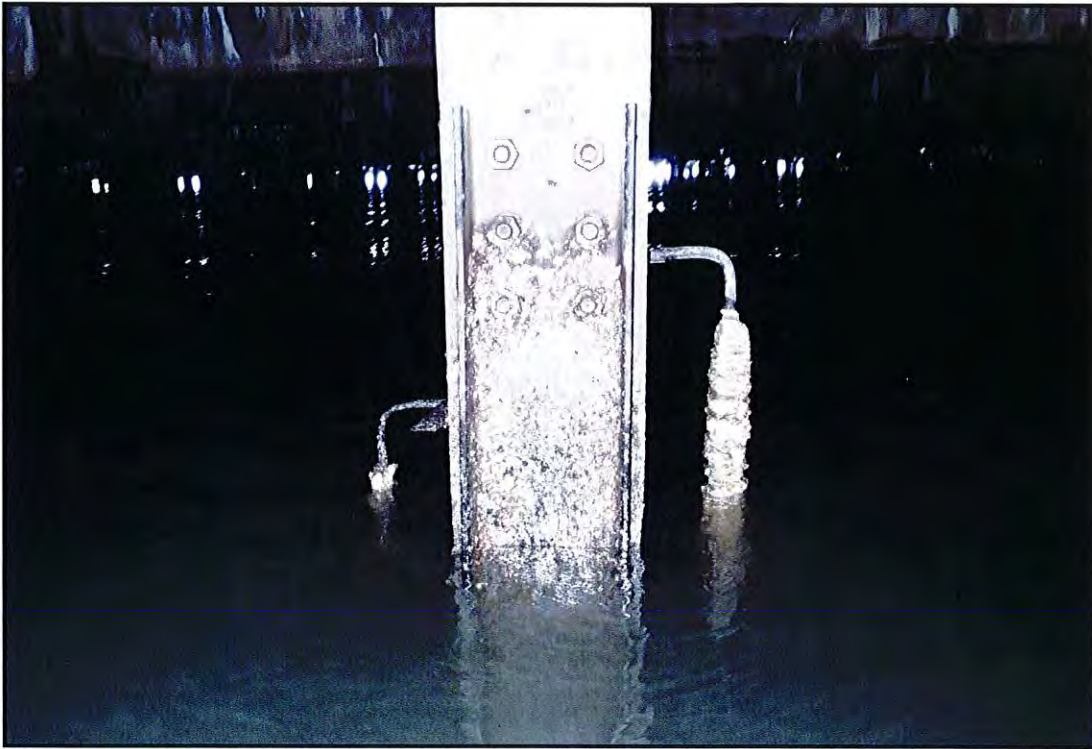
Typical C-channel pile repair bolted to the flanges of H-pile I-bar 9-bar, view looking west. Note the depleted anodes attached to each side of the H-pile.
